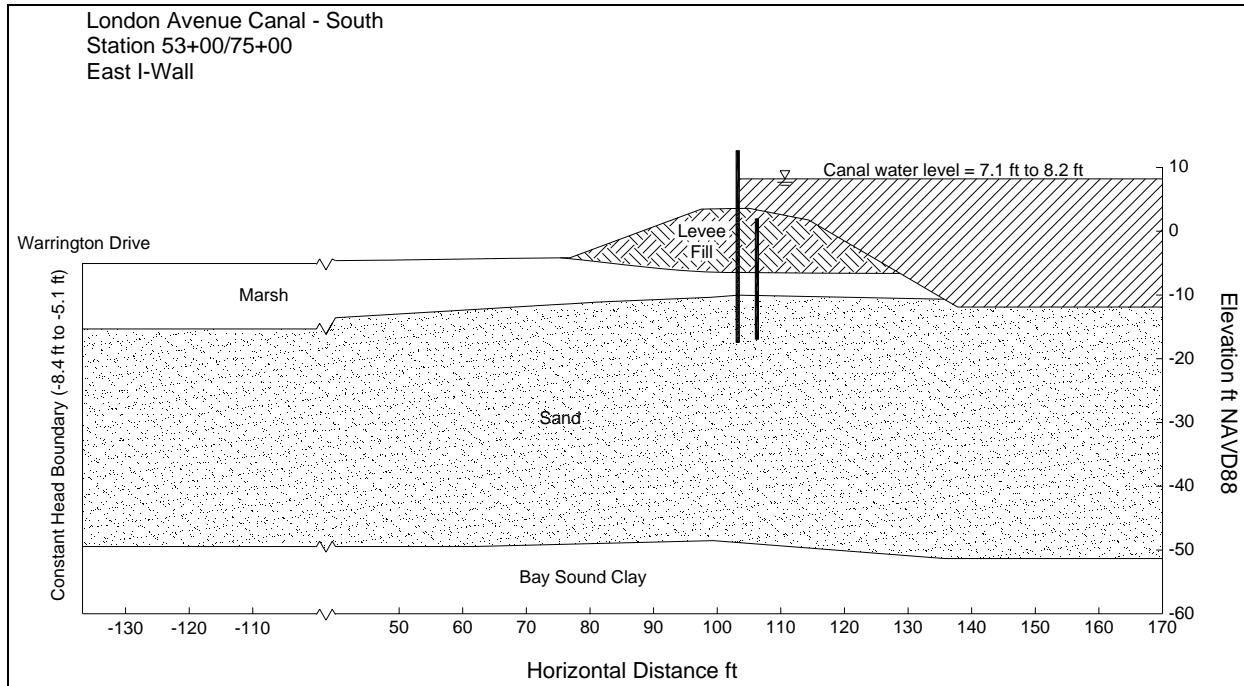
Schematic Cross Section at London South Breach, with Seepage Boundary Conditions
